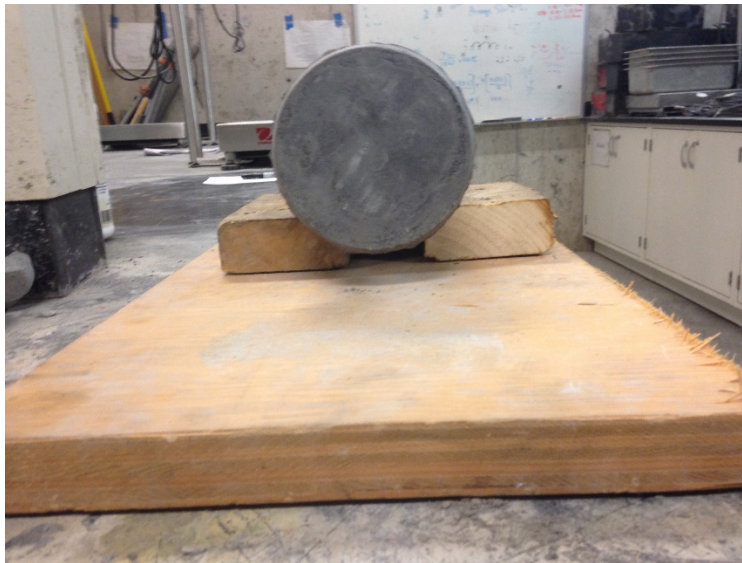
Demonstration of the stand built for stabilizing the cylinder, with a concrete cylinder installed
